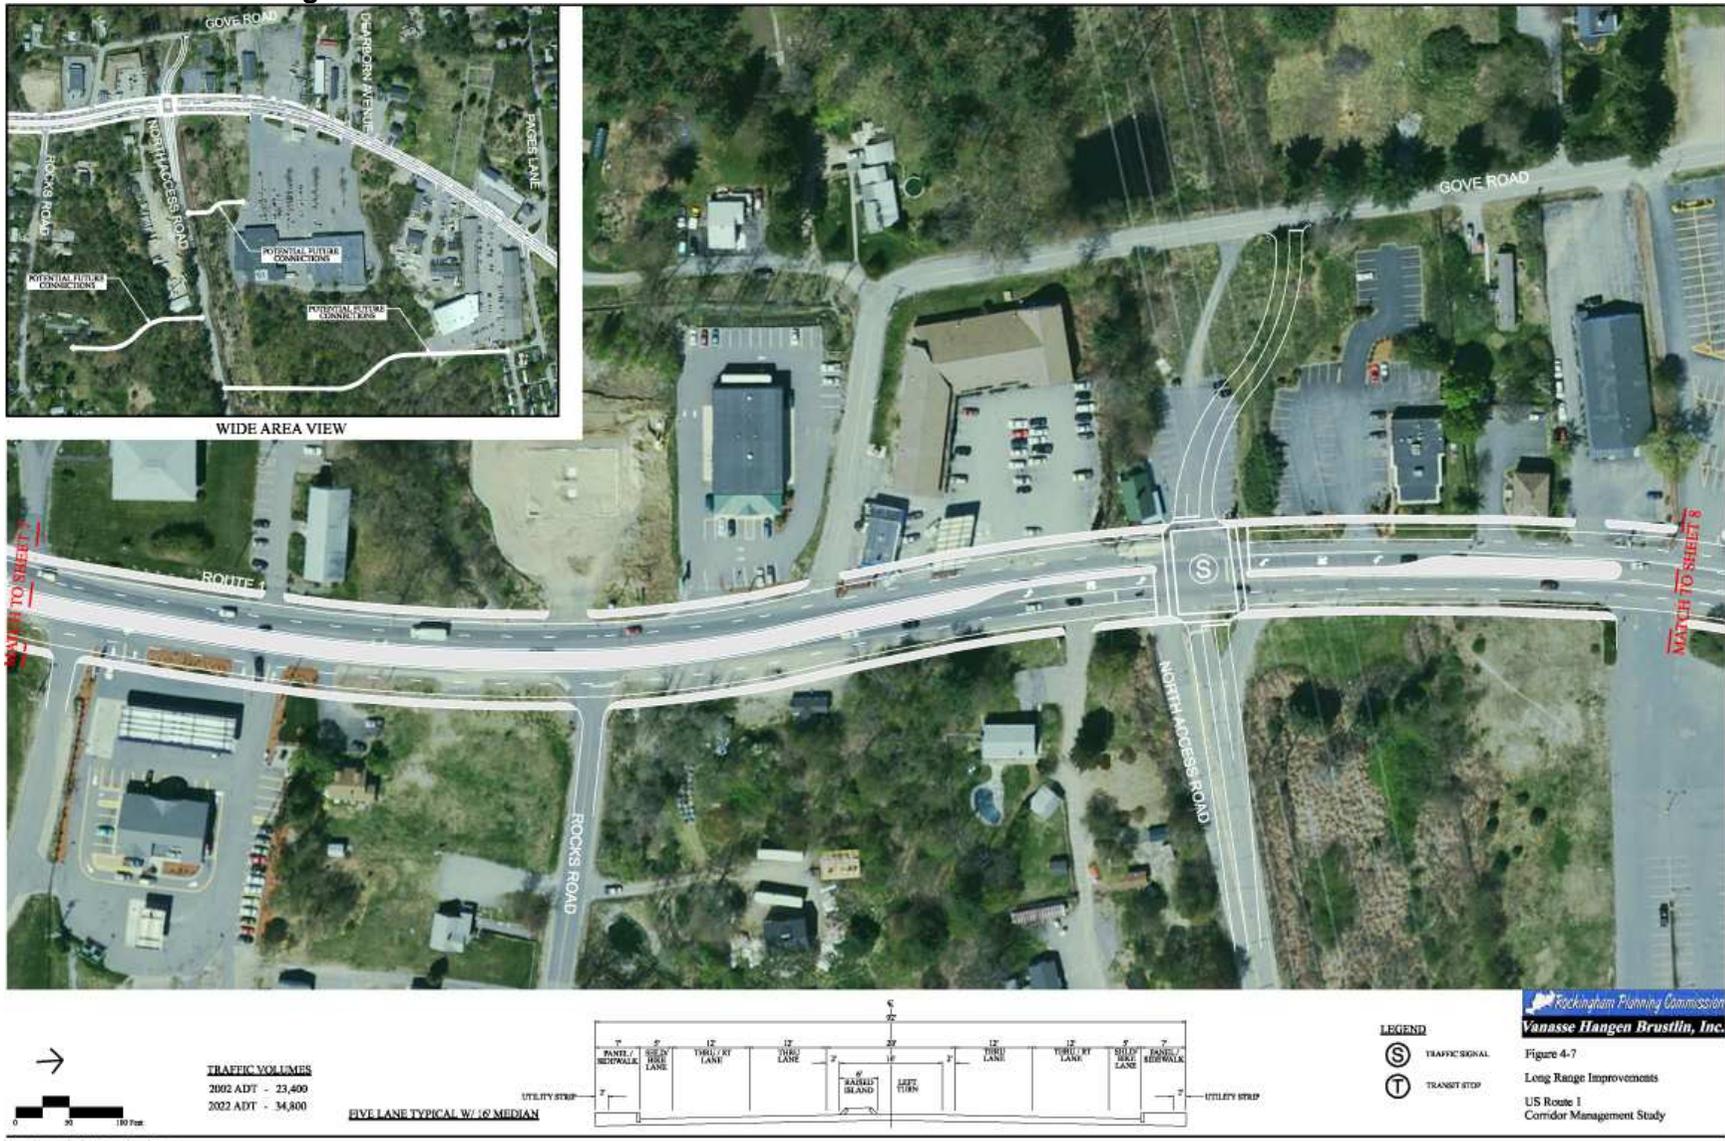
New Connection for Gove Road and Potential Cross-Connections
